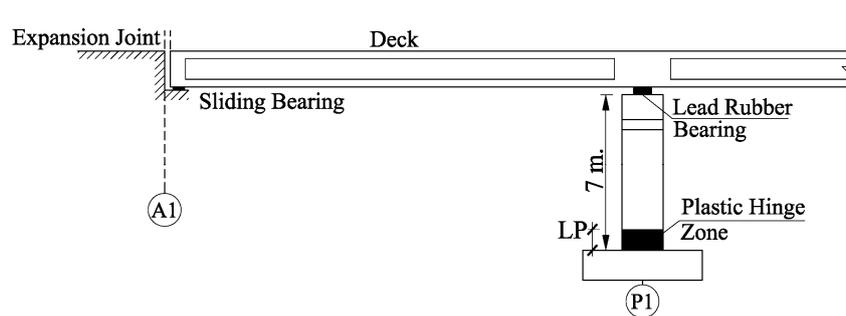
Layout of seismic isolator and position of plastic hinge of column in longitudinal view of the bridge
